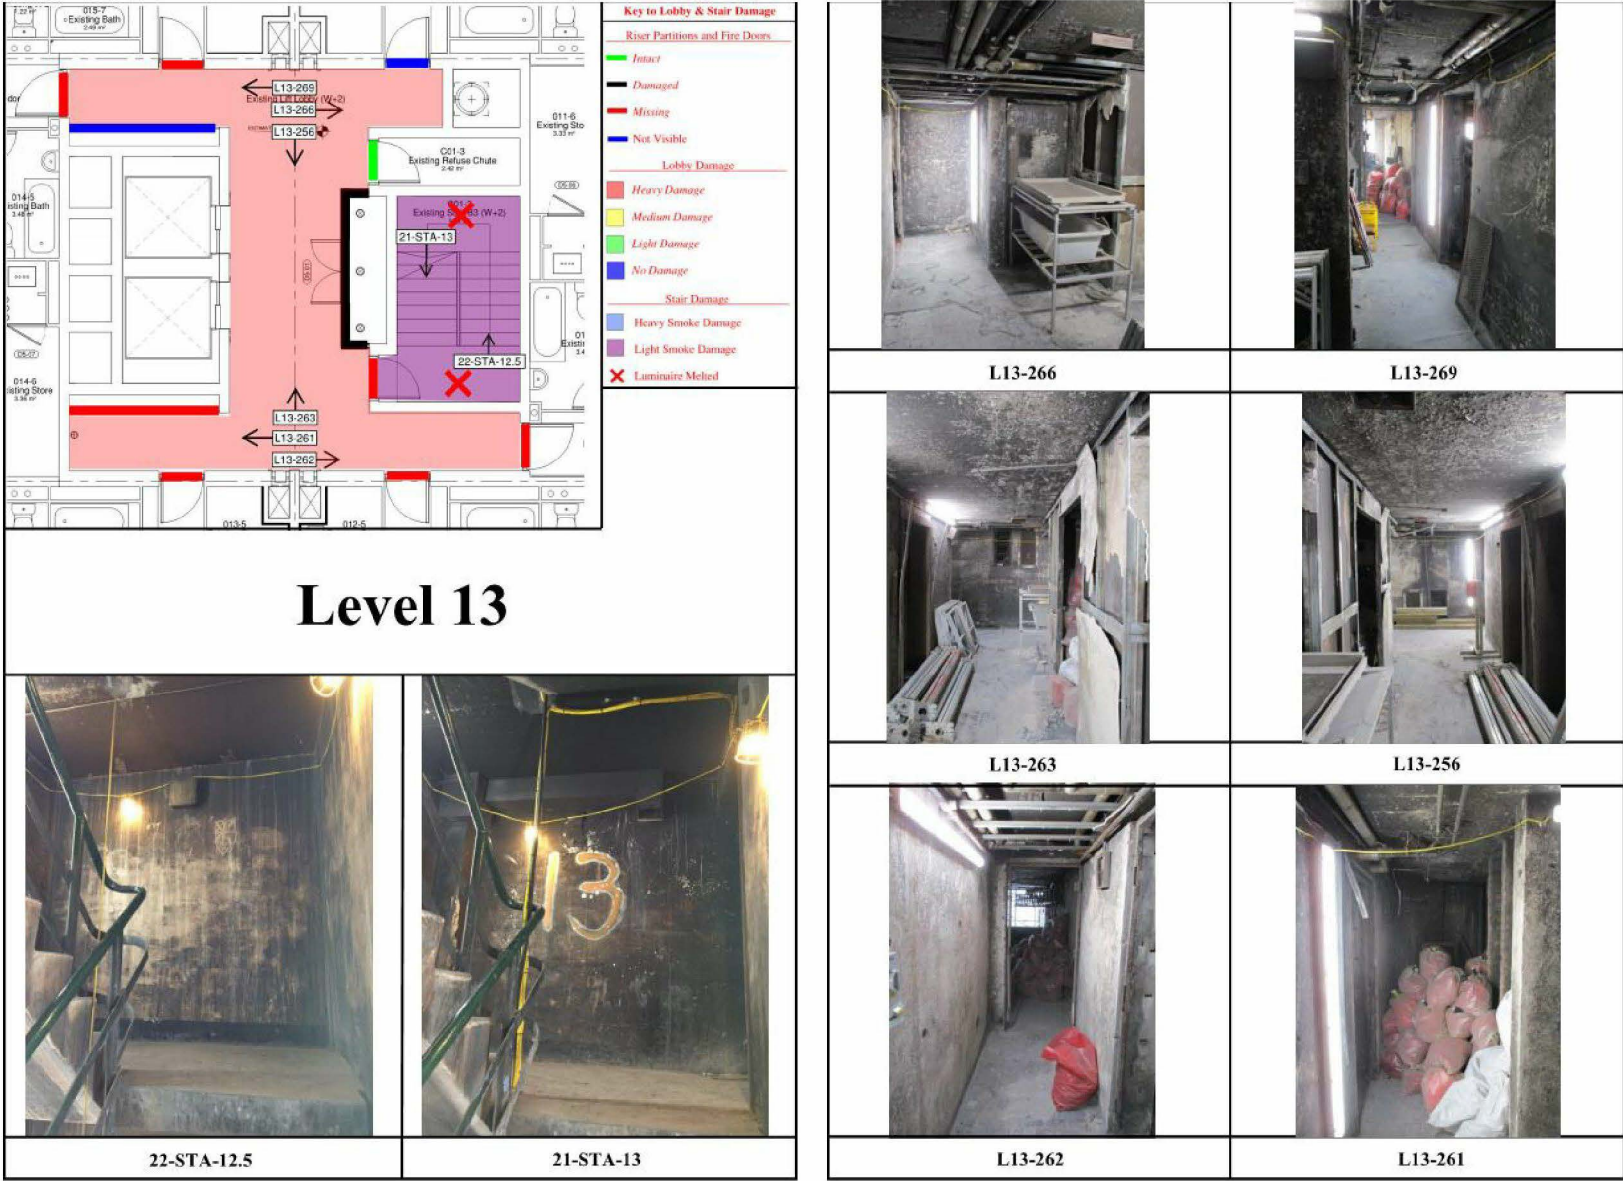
Record of stair and lobby damage from post fire site inspection – Level 13 (plan adapted from SEA00010474)
